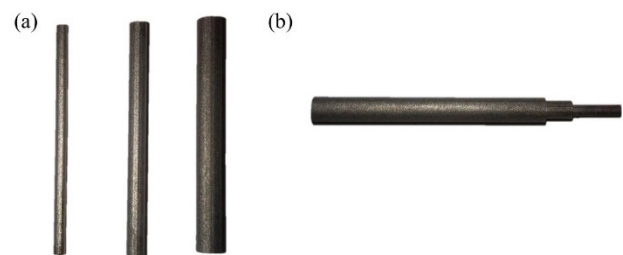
Long-term corrosion threshold monitoring system from (a) three extracted tubes from steel rebar and (b) final arrangement of the tubes
